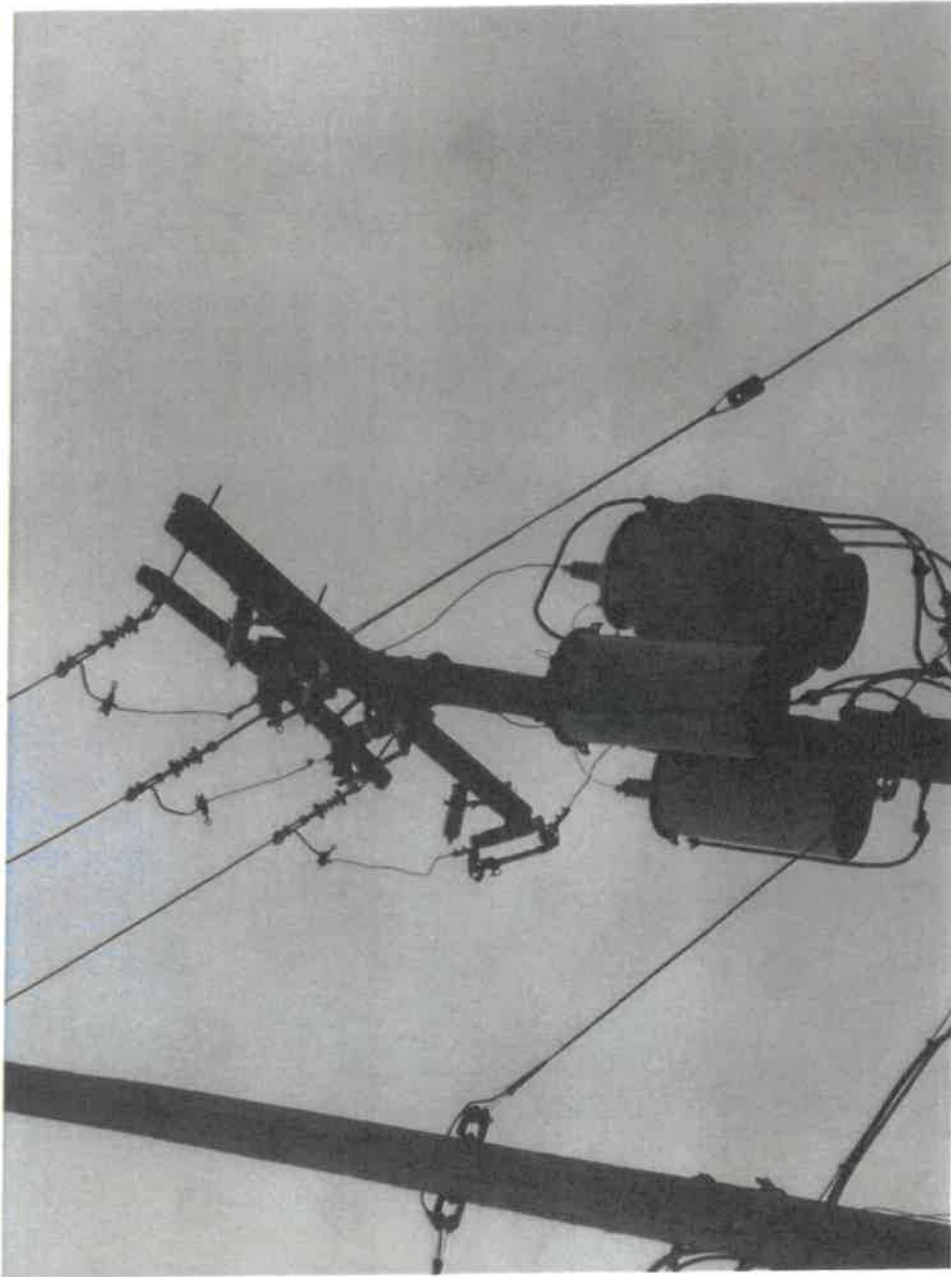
Close Up of Existing Pole on Project Site (Facing North Towards Project Site)
